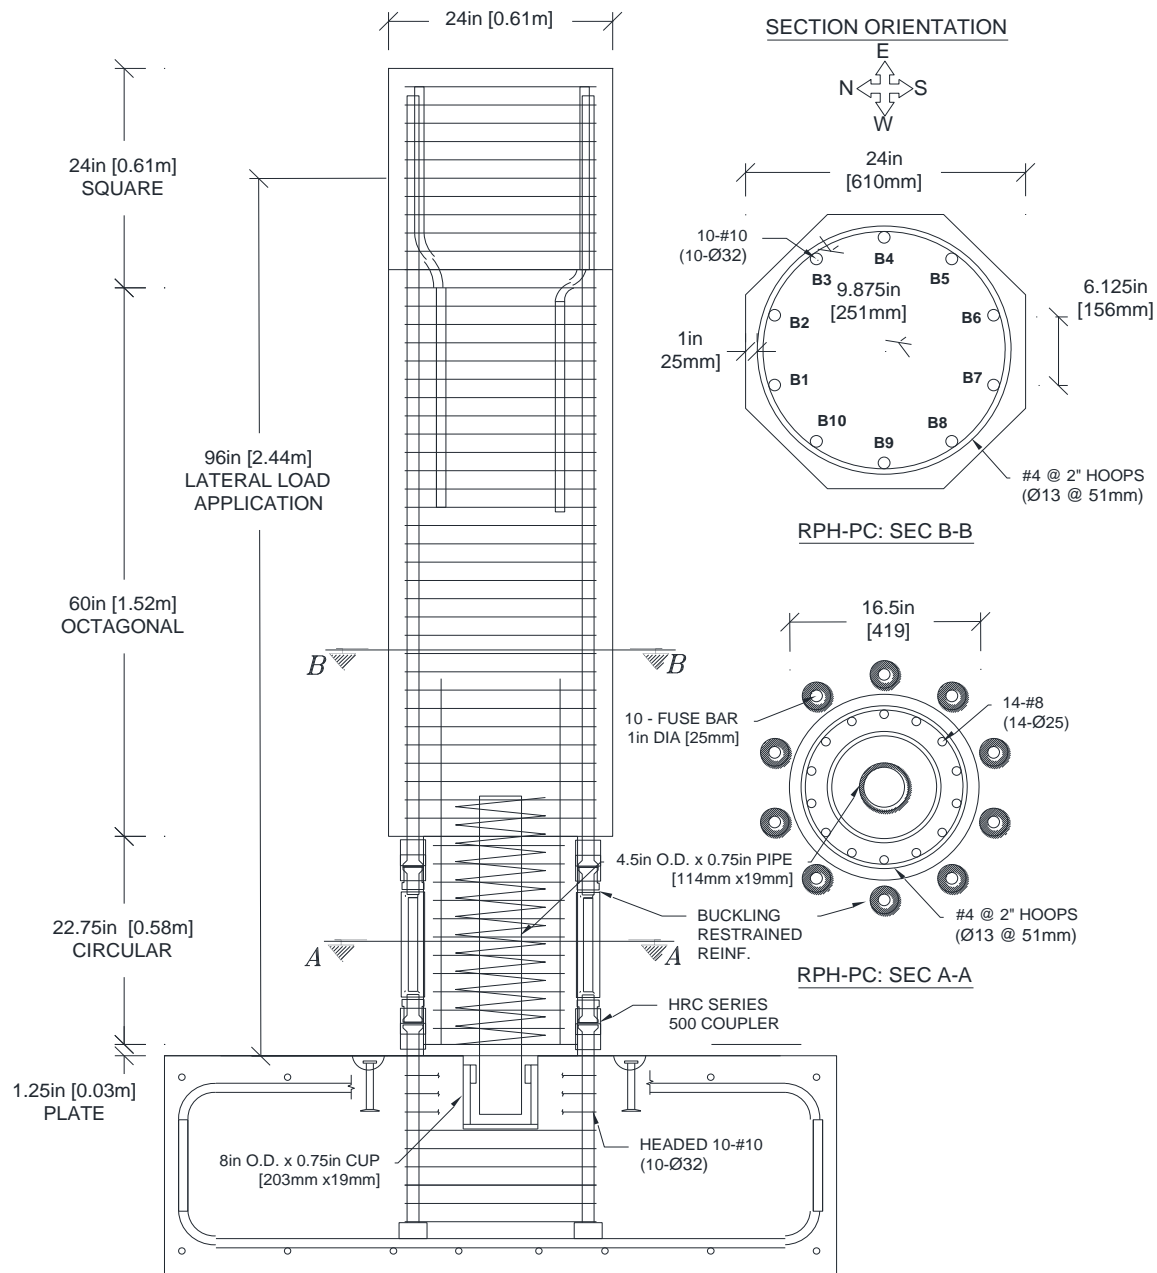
Reinforcement Detailing of RPH-PC Column
